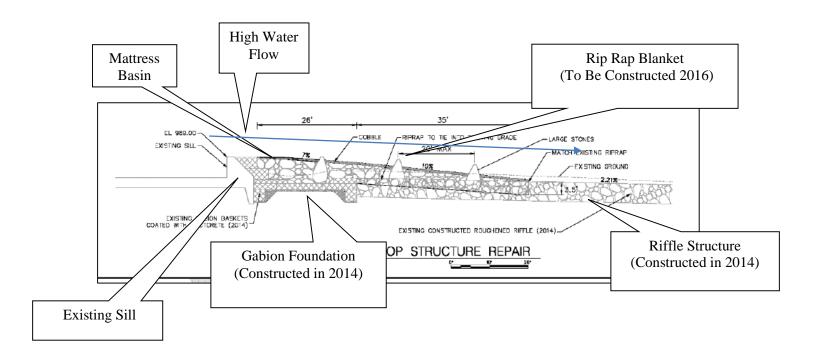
Cross Section of the Spillway Toe Showing Proposed Location of Rip Rap Installation.
